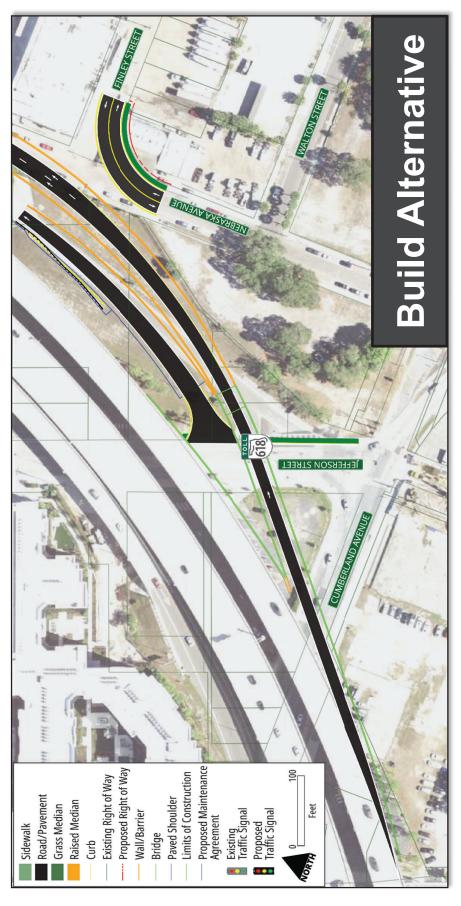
Alternative 1 – Whiting Street Off-ramp (Exit Ramp 6B)
